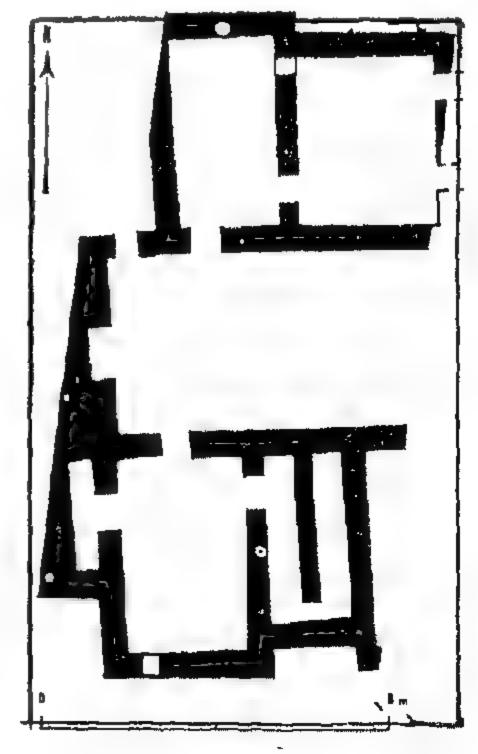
Plan of a house at Madhur (after Killick and Roaf 1979).
